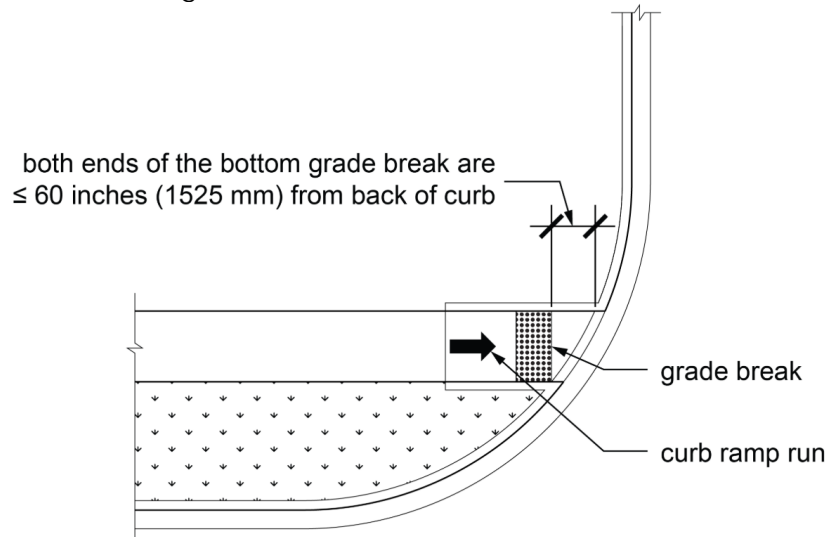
Perpendicular Curb Ramp at Street Corner. Source: PROWAG Figure R305.2.1(b).
